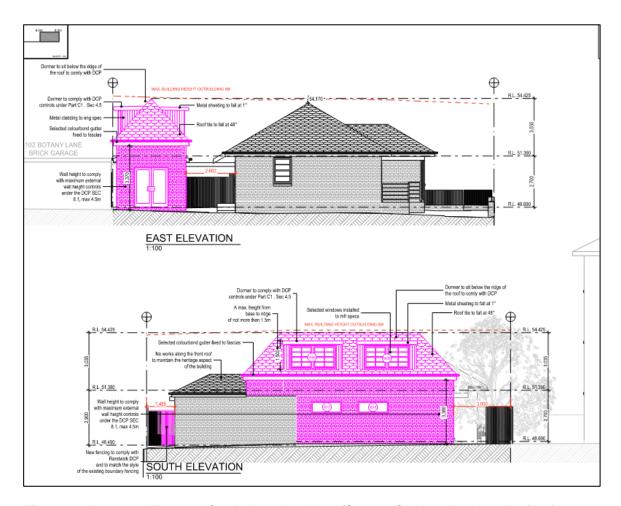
Proposed East and South elevation plans (Source: Gardner Design & Drafting).
